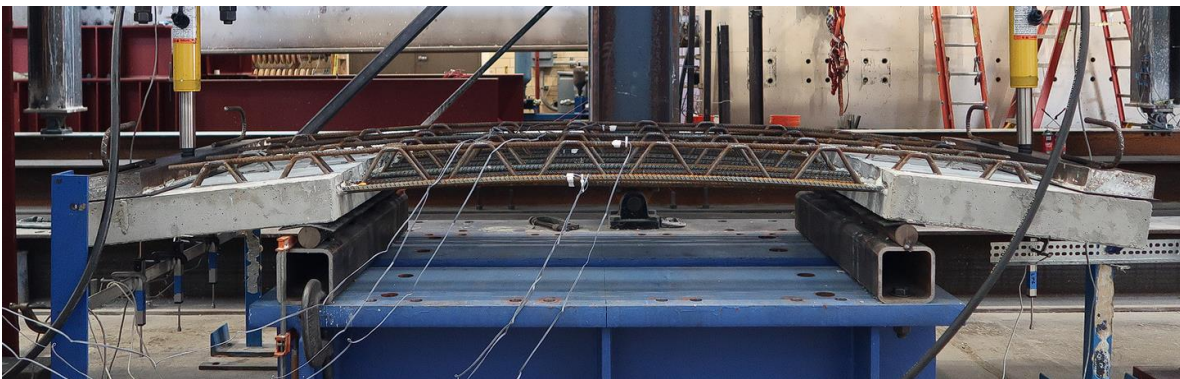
Specimen V-H-U49-#5 achieves extreme deflections prior to halting the load test
